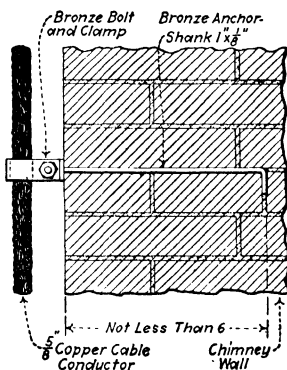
Anchor clamp for securing cable to chimney wall.
